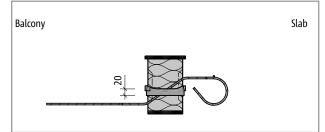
Schöck Isokorb® XT type Q-V1 to V4: Product section
